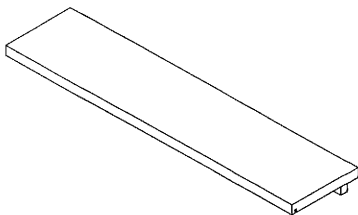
Affixing Fixture Sockets to Horizontal Framing Members.
